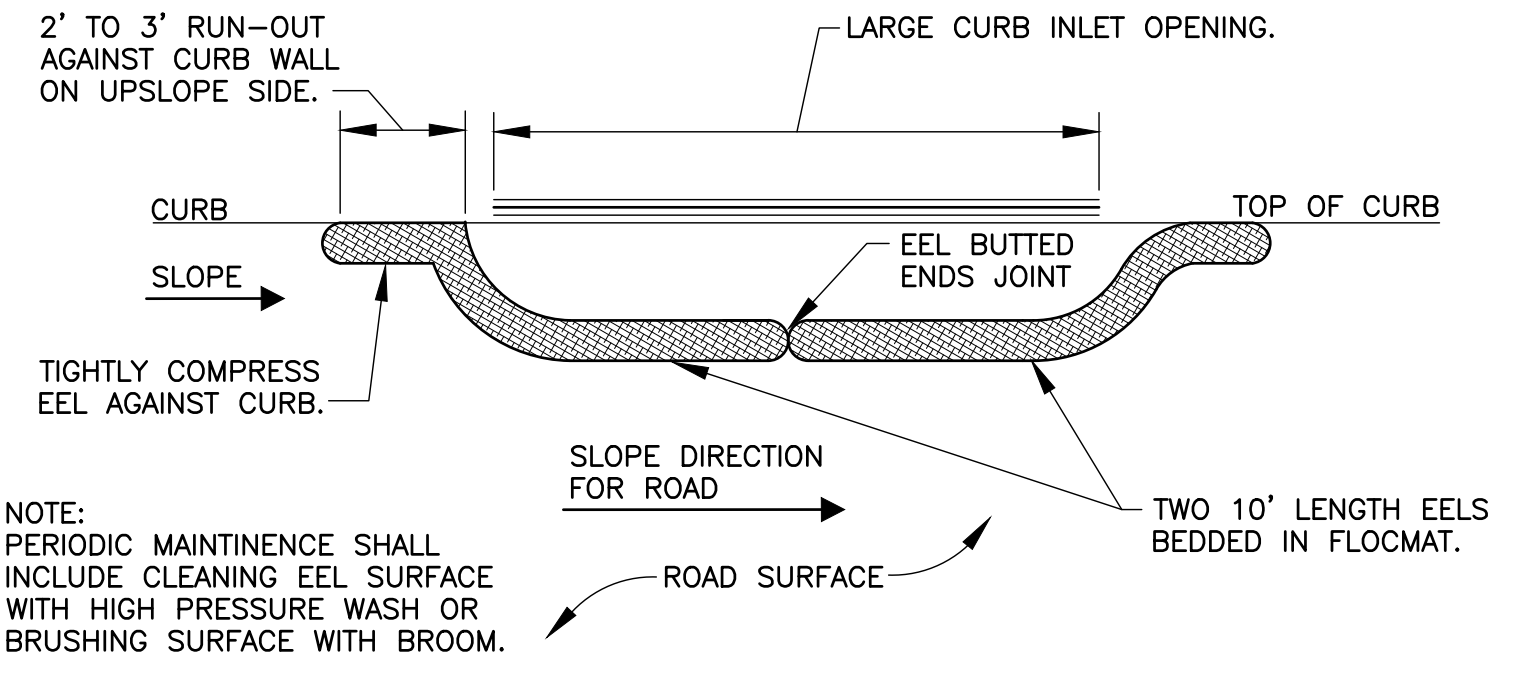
B: INLET SEDIMENT TRAP N.T.S.
